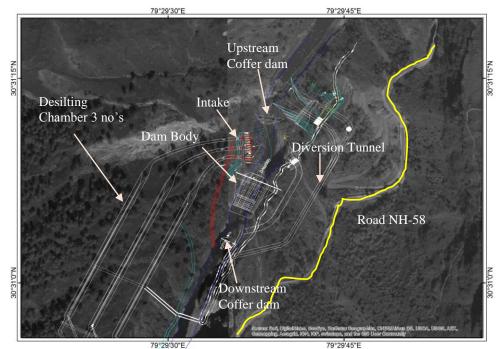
Dam, Intake, Desilting chamber and Diversion tunnel plan laid over satellite imagery(ArcGIS10.2 Base map image)
